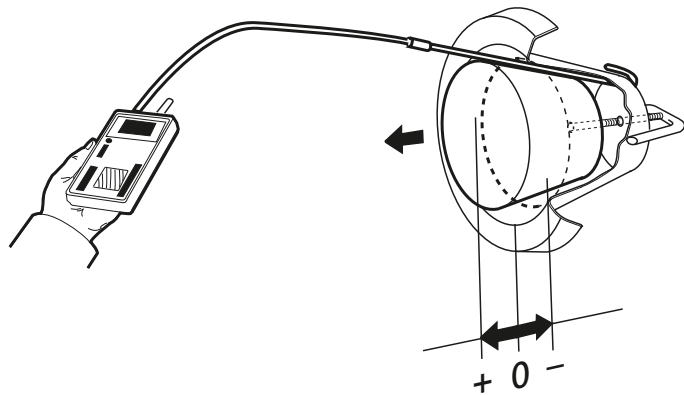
Example with an extract air diffuser. Measurement with one tube.
